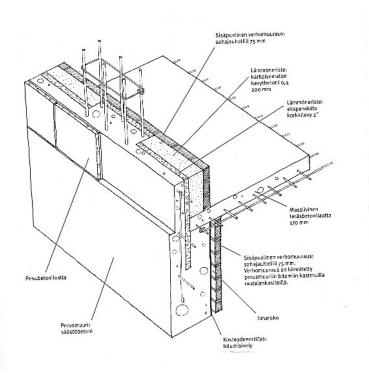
Example house '52, exterior wall and roof of basement (6, p.127)
